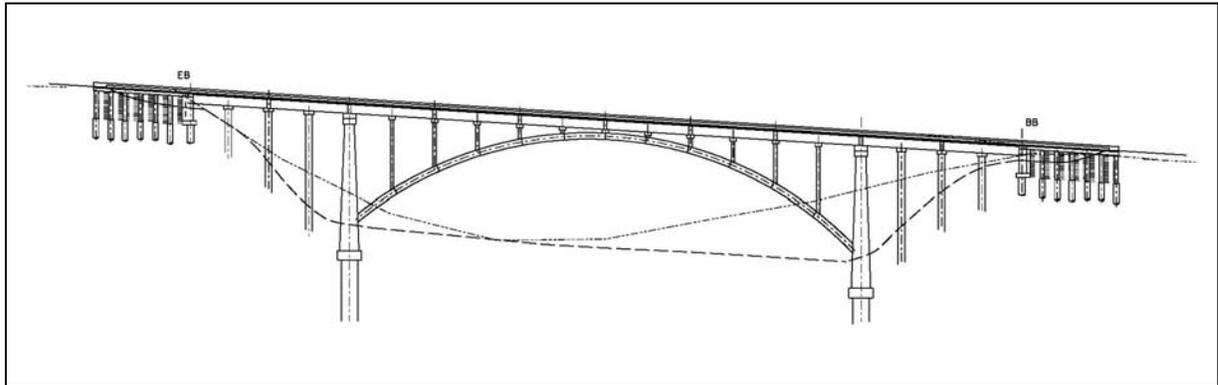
A conceptual design option for a new bridge that features a concrete arch main span, recalling the theme of the historic bridges along Highway 1.
